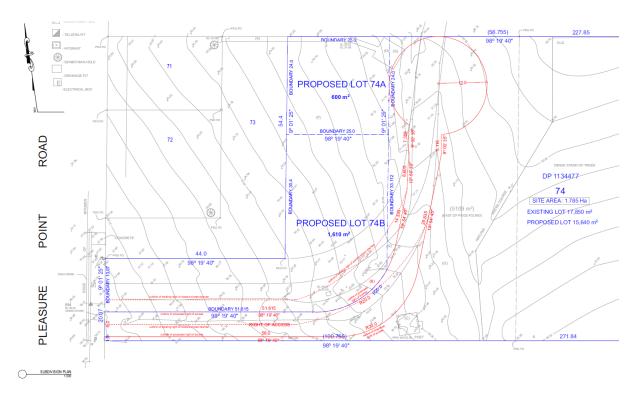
Proposed Subdivision Plan DA-724/2016 (LCC E-Planning Portal)
